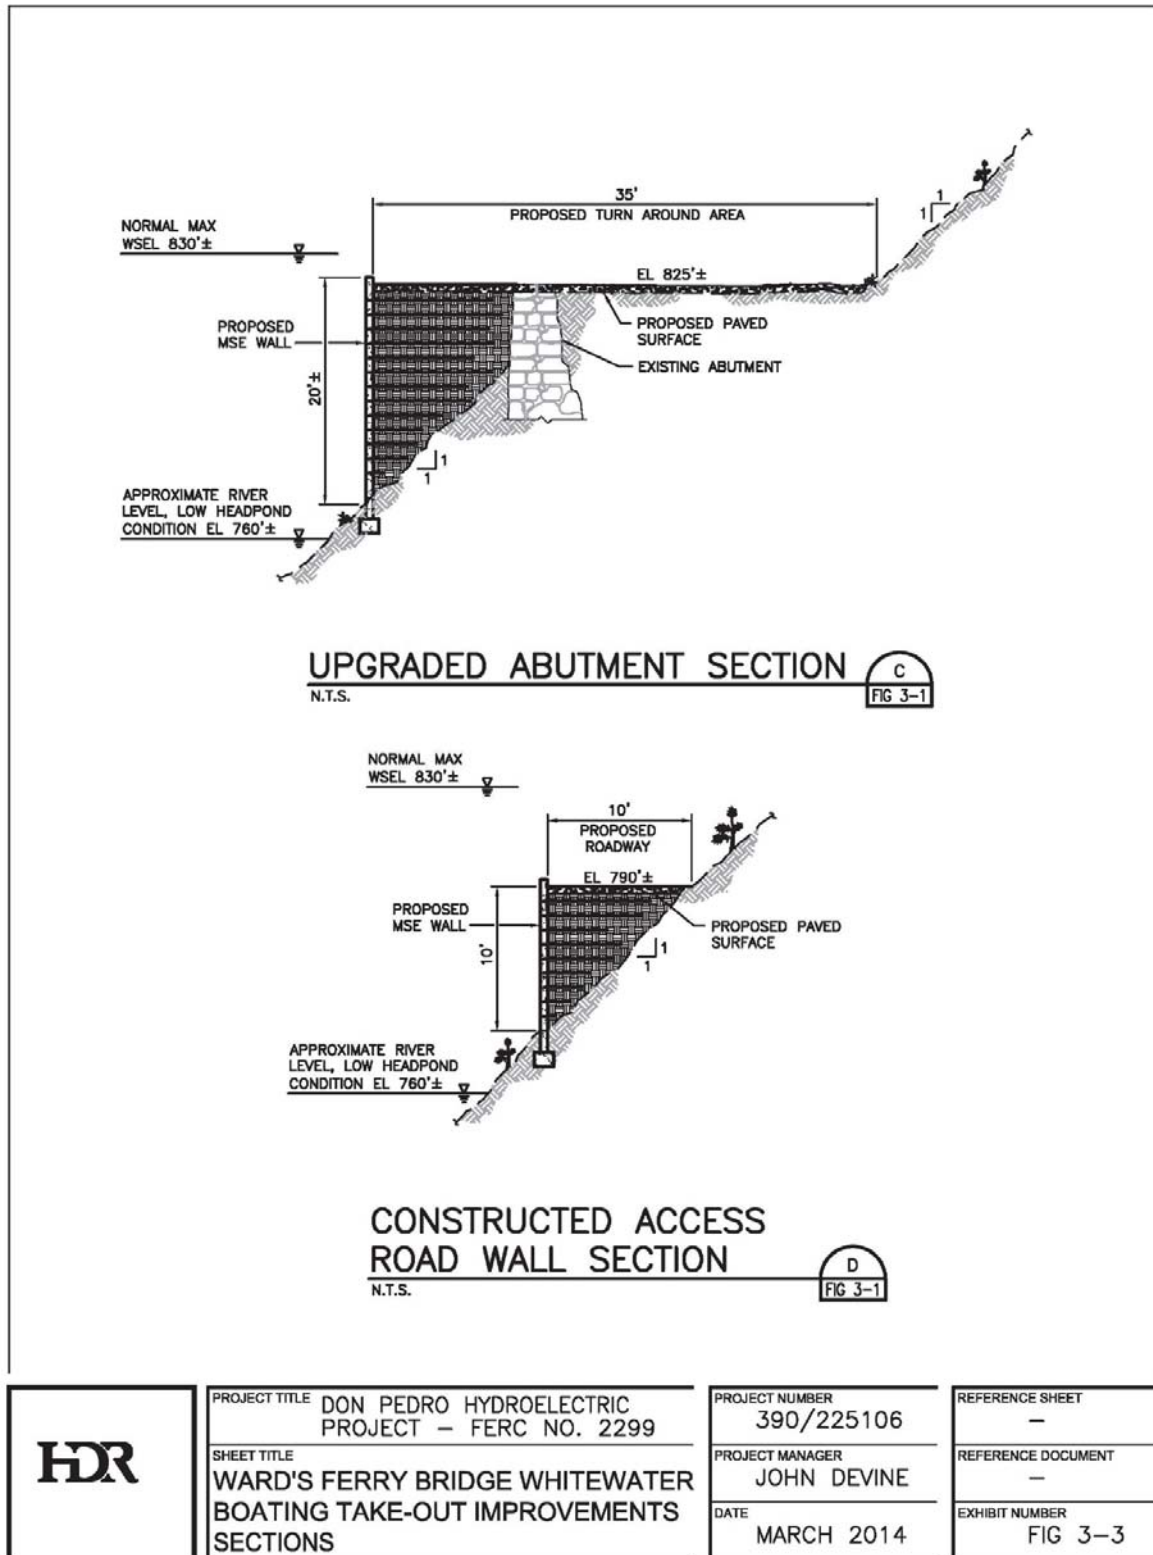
Ward's Ferry Bridge whitewater boating take-out improvements -- sections.
